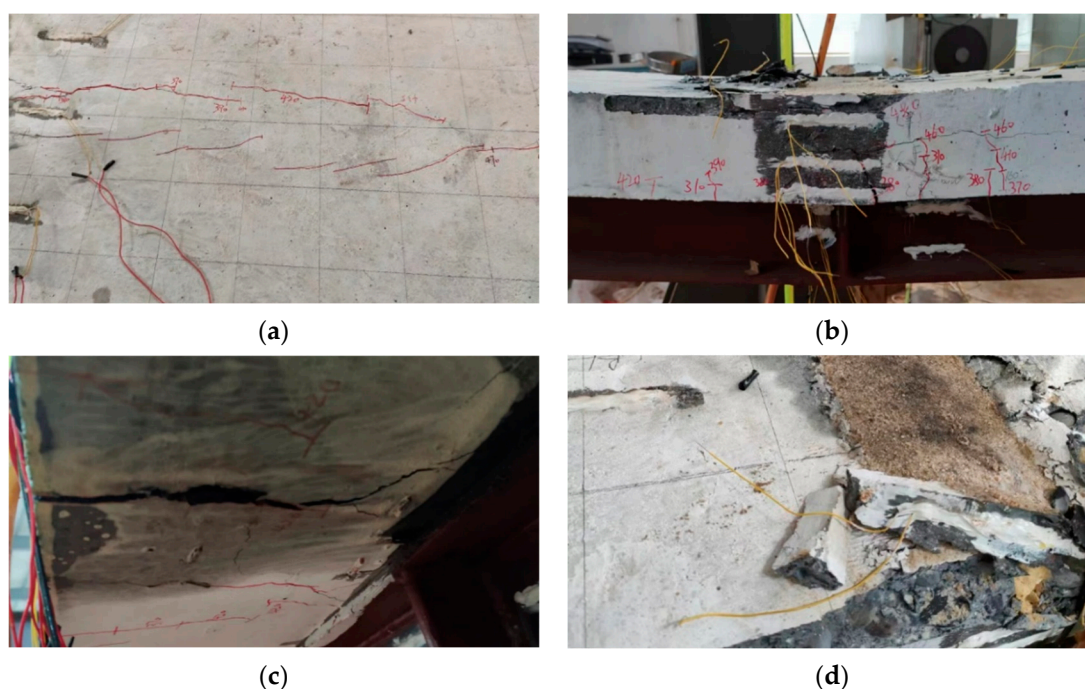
Experimental destruction phenomena: (a) transverse cracks, (b) diagonal cracks, (c) longitudinal through cracks, and (d) concrete spalling.
